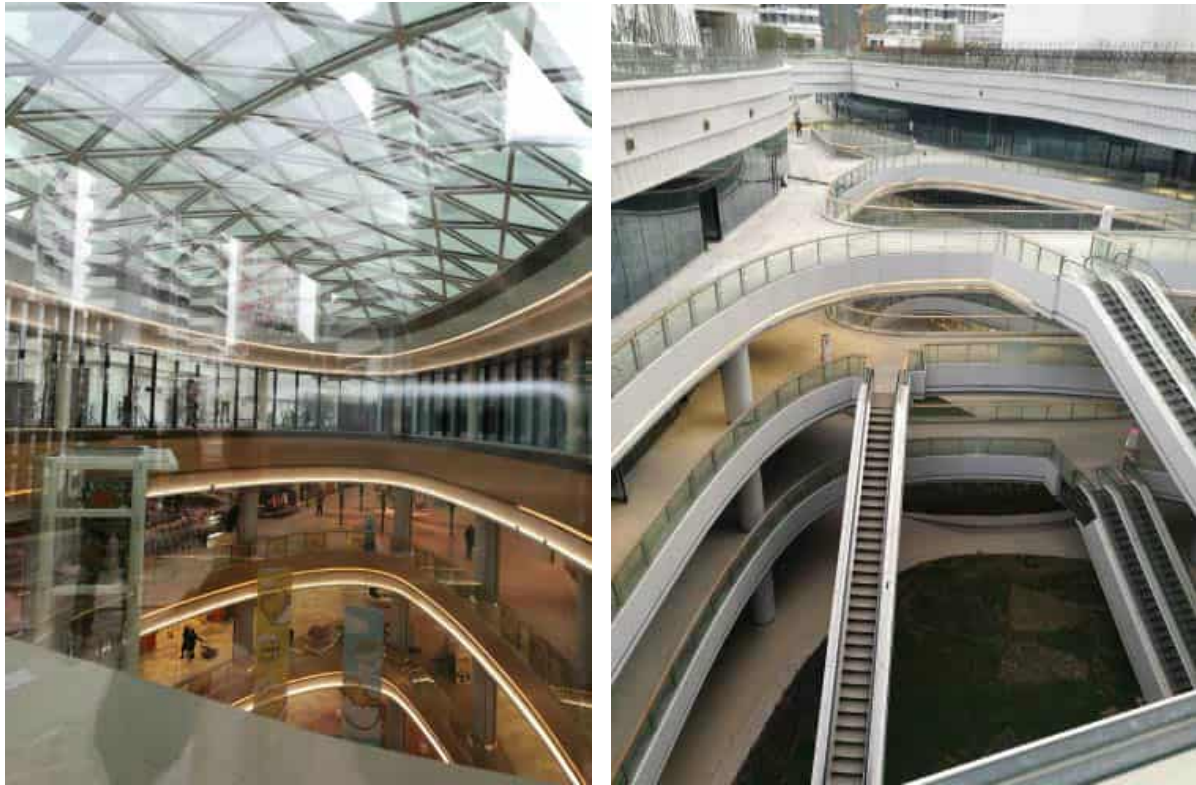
Multiple levelled public spaces inside and outside (in construction)
